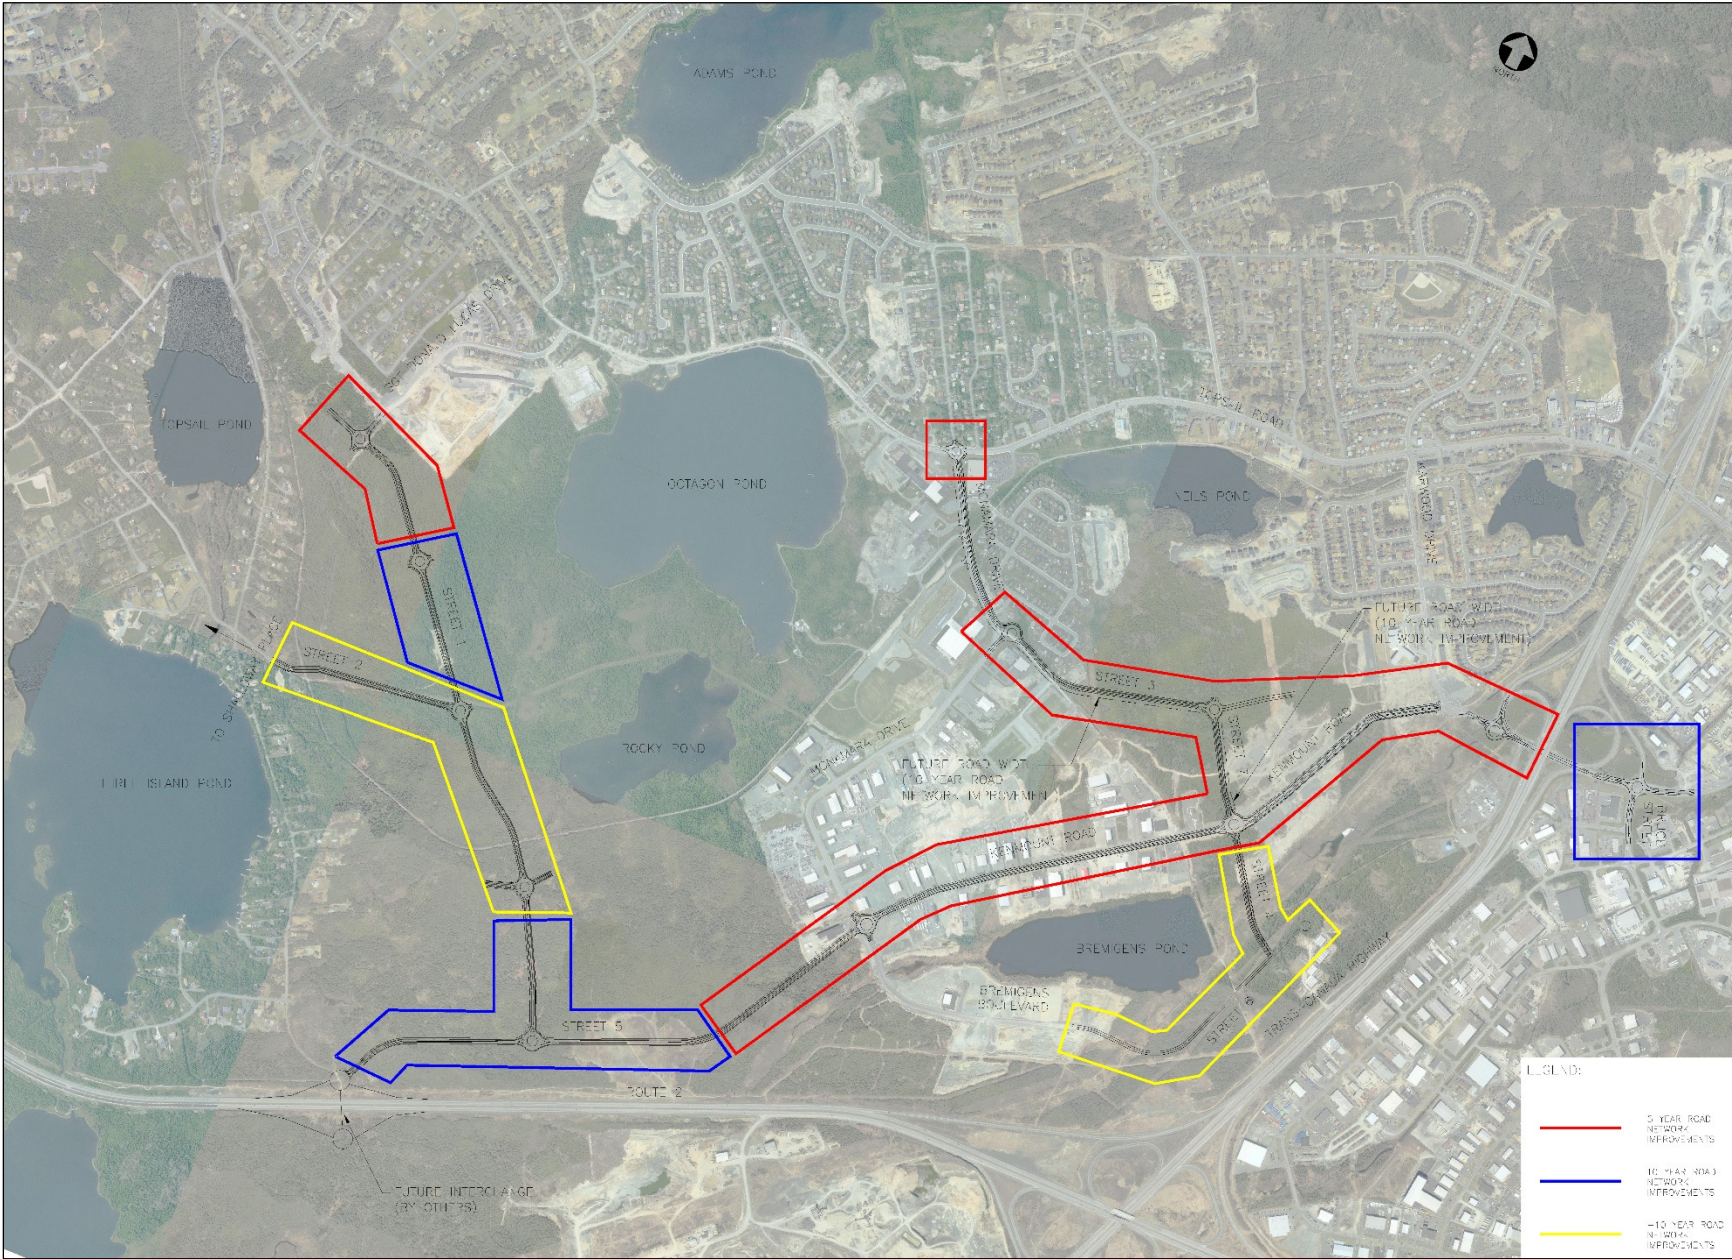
Karwood Market Area Traffic Study Network Improvement Plan
